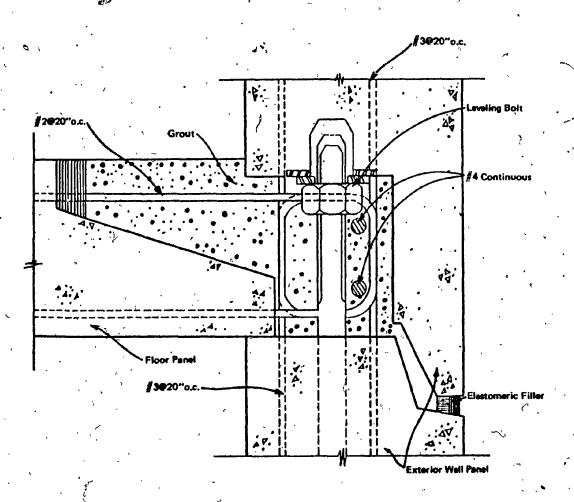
B.S.I.; Exterior Wall to Wall Joint (Ref. 32)
